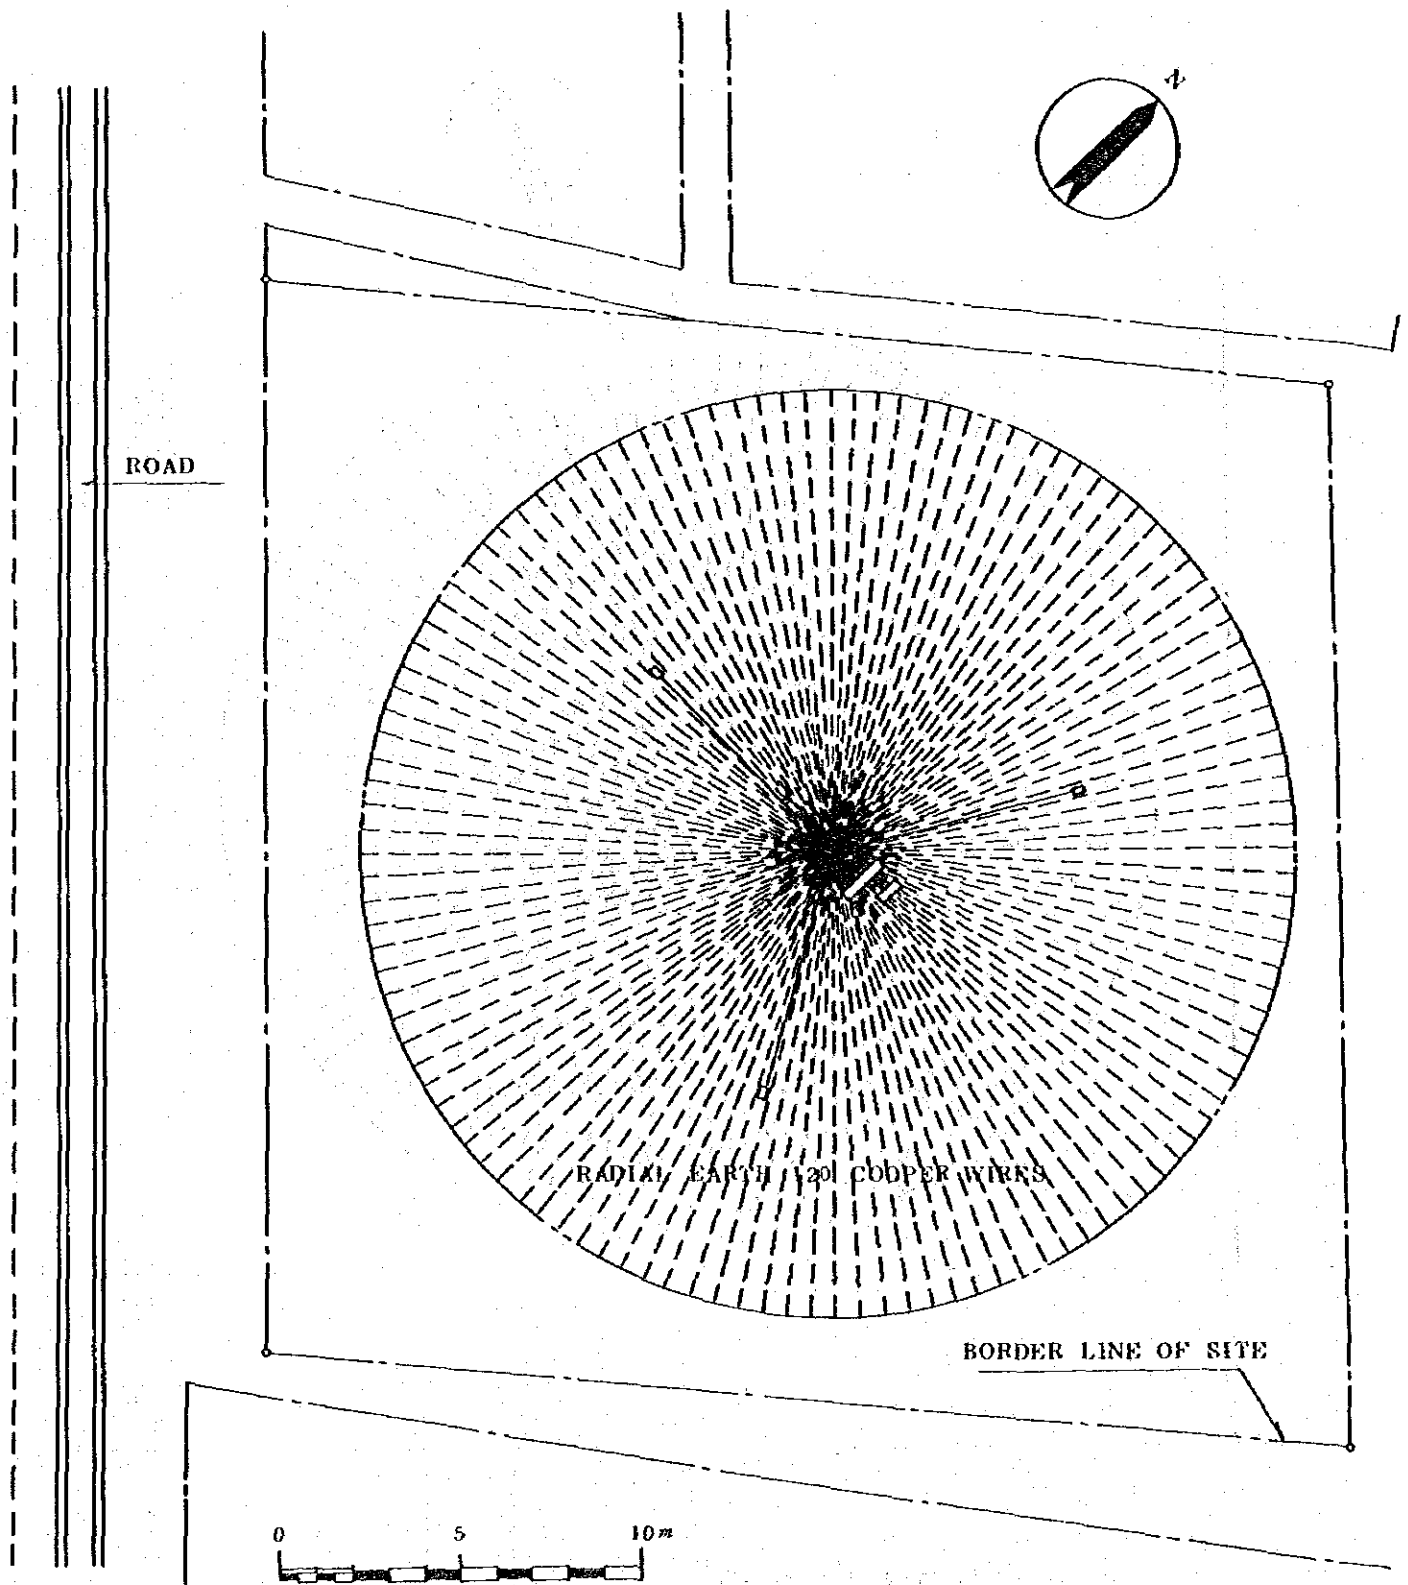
Layout of Tower and Earth of Wad Medani !
